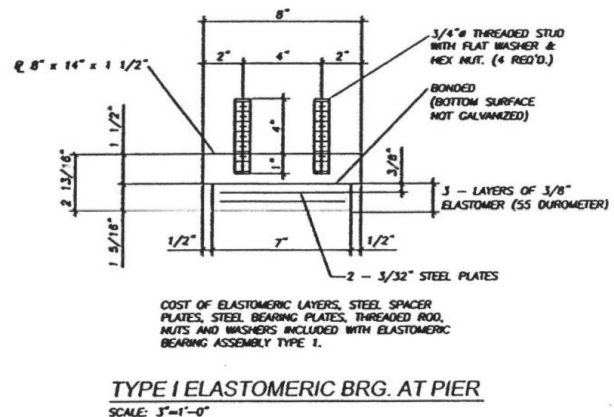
Plan detail of steel reinforced elastomeric bearings (2002)
